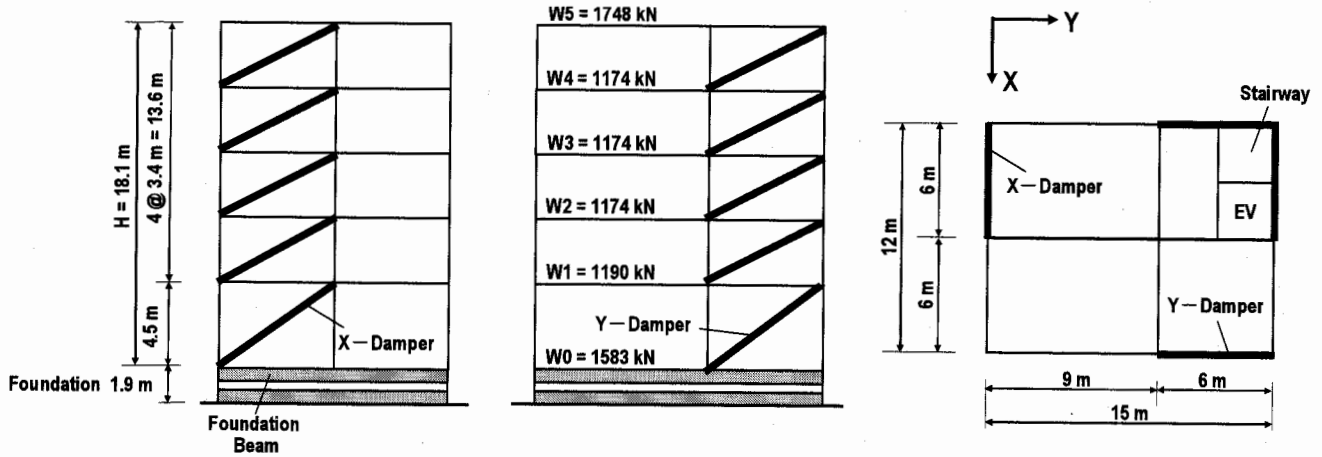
5-Story Building Specimen with 20 Dampers (Building Configurations are Tentative)
